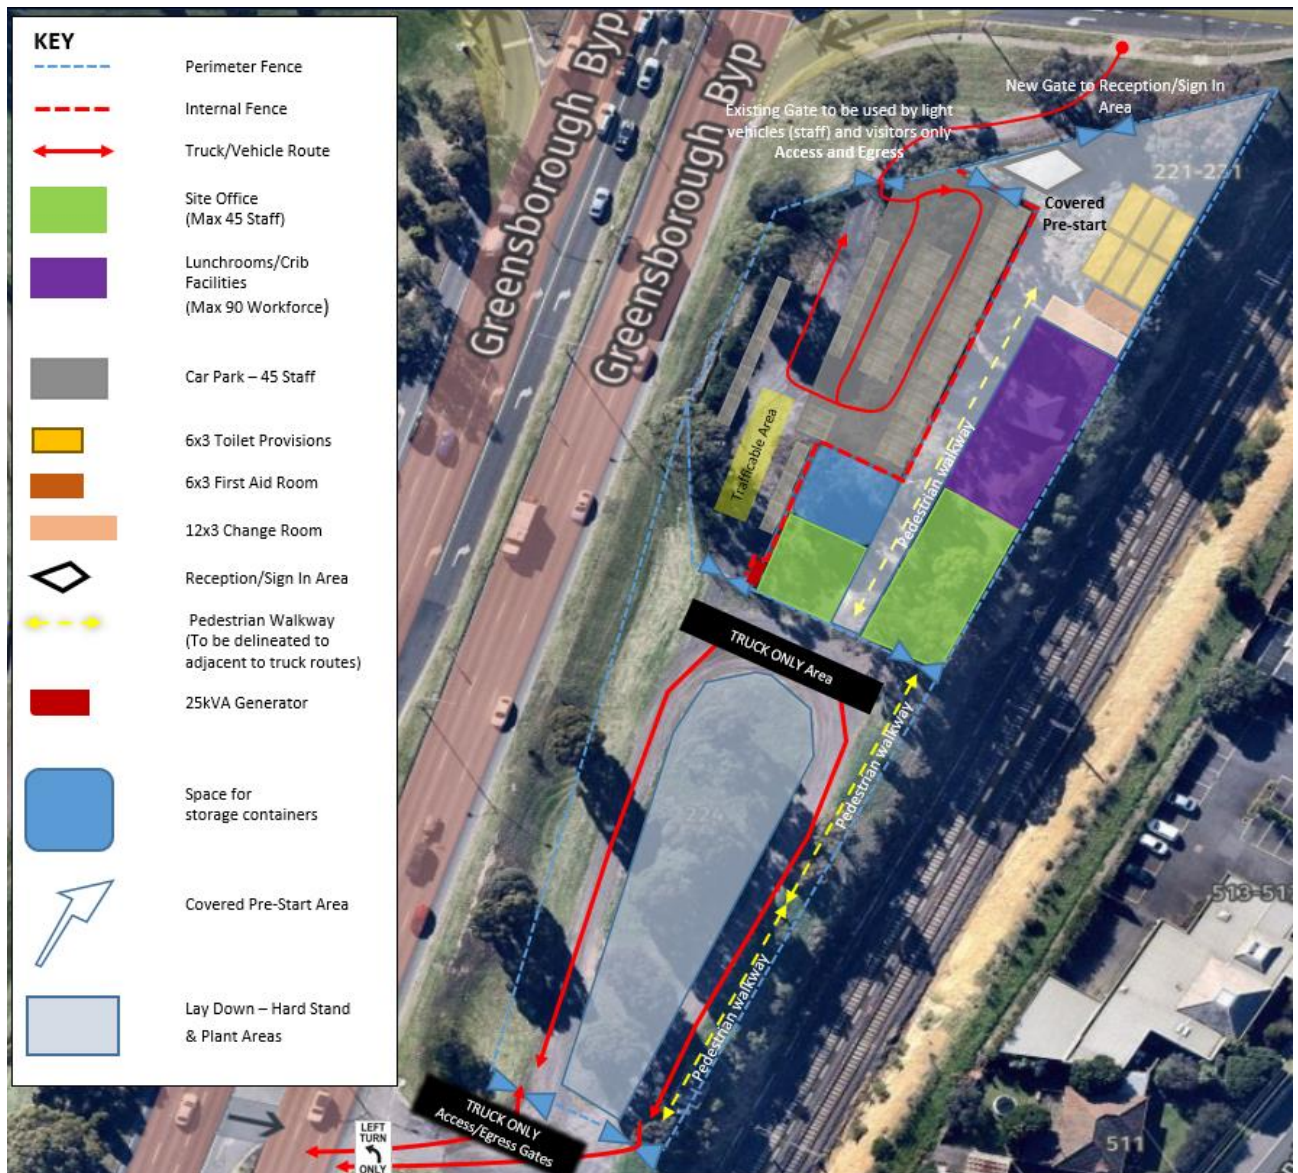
Grimshaw Street compound proposed Site Plan 1 of 2 (Northern end)
